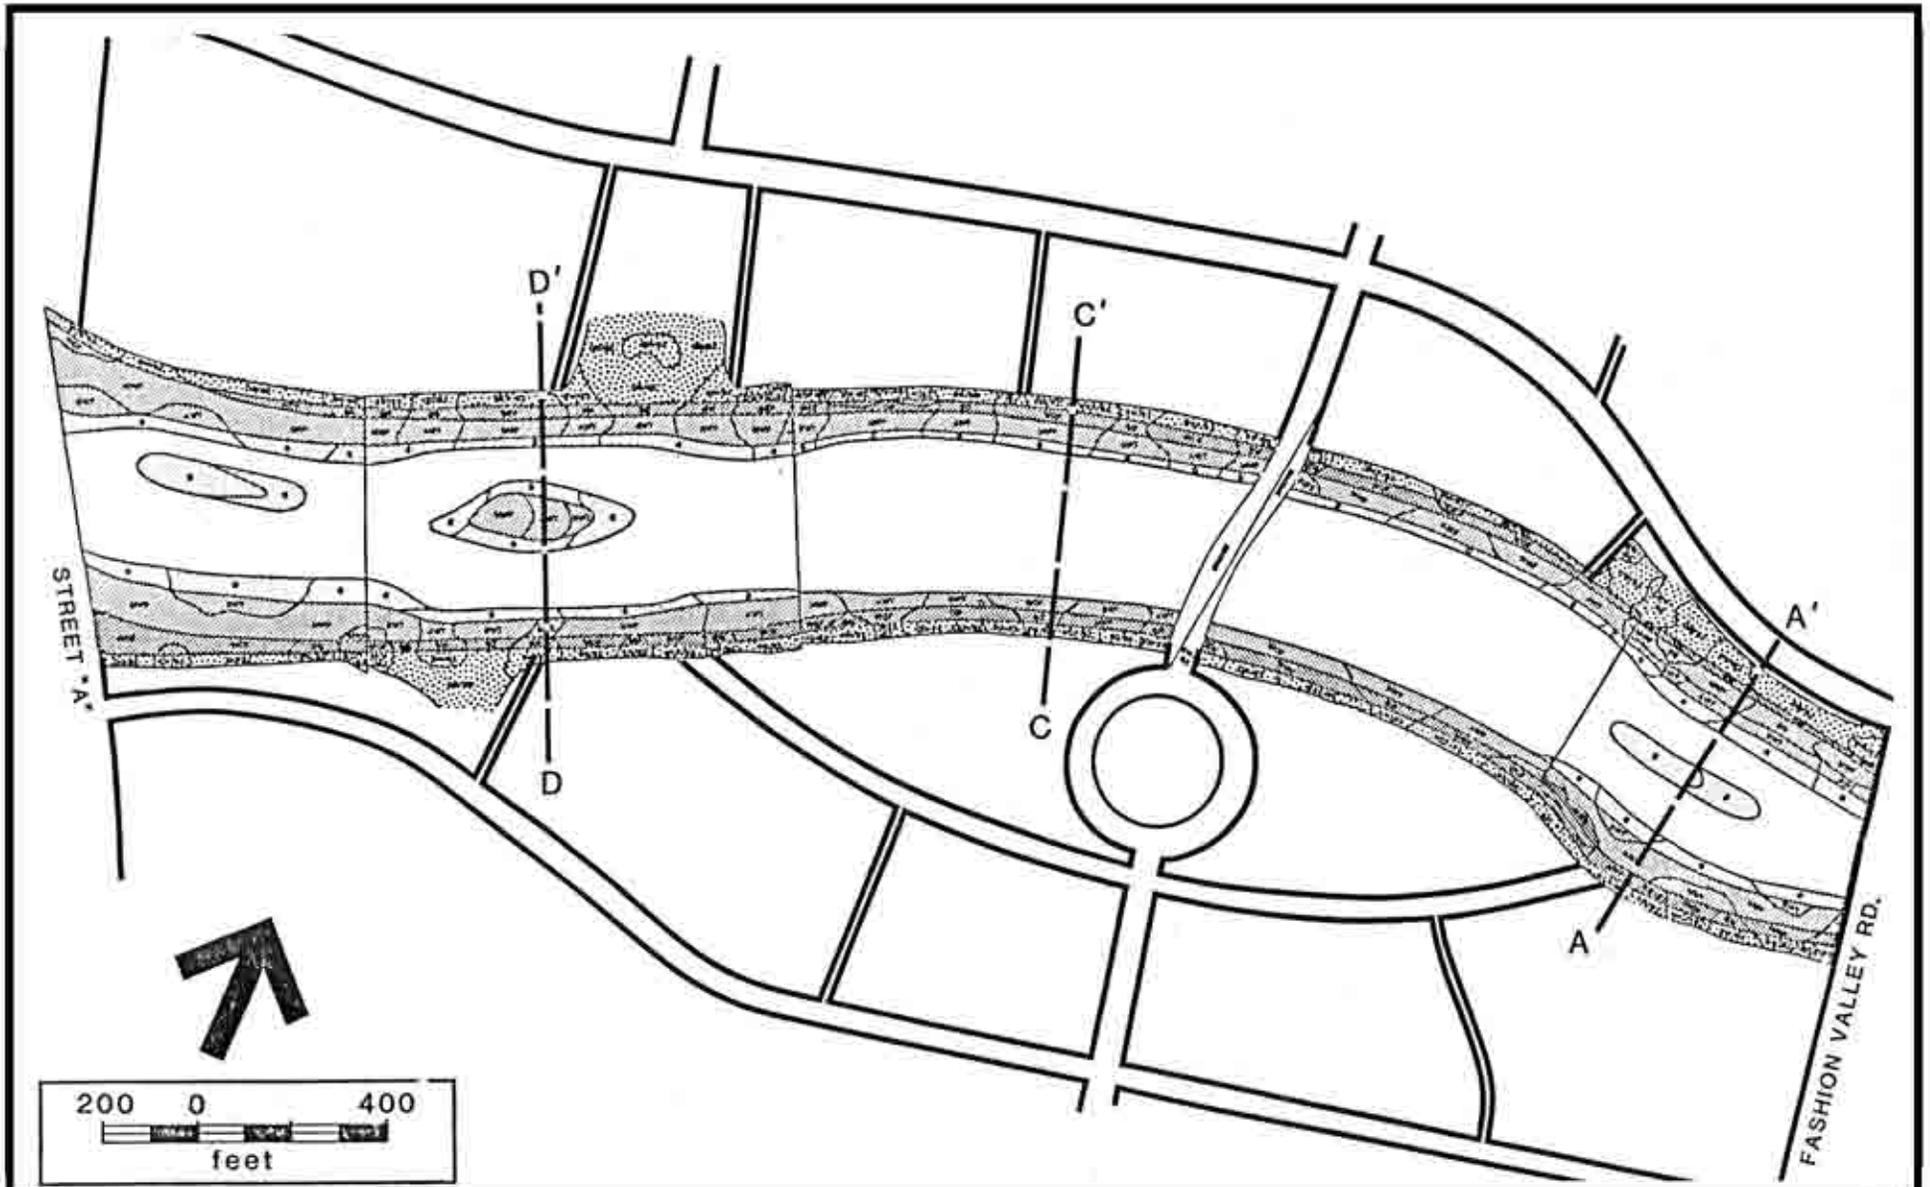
REVEGETATION PLAN FOR THE LEVI-CUSHMAN SPECIFIC PLAN RIPARIAN REVEGETATION PLAN
